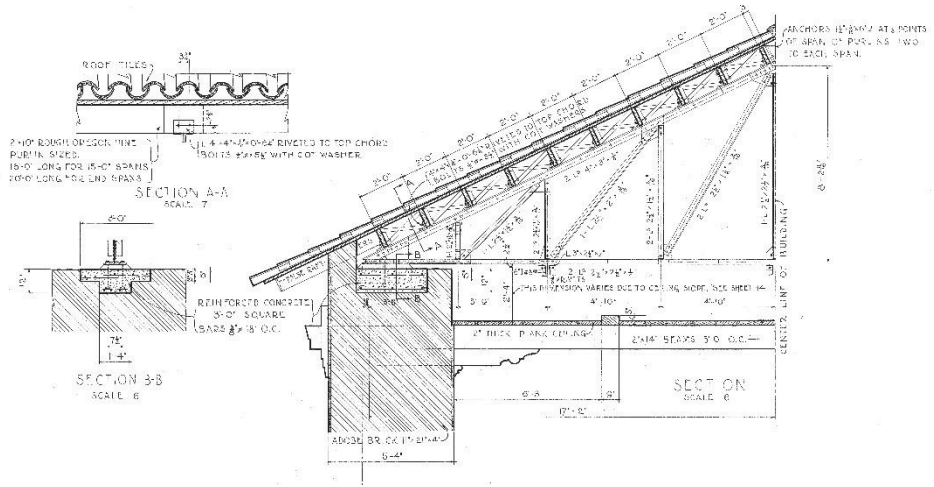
Section detail drawing of the church of San Miguel Archangel (HABS). The top beam in reinforced concrete had been inserted supporting the system of the roof also of the convento.
